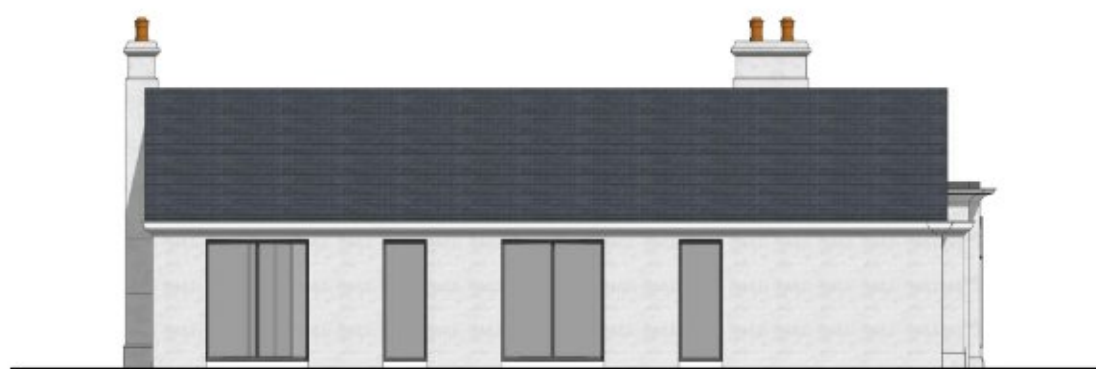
South-east Elevation of House Type B as now proposed (extract Drg 5B).
